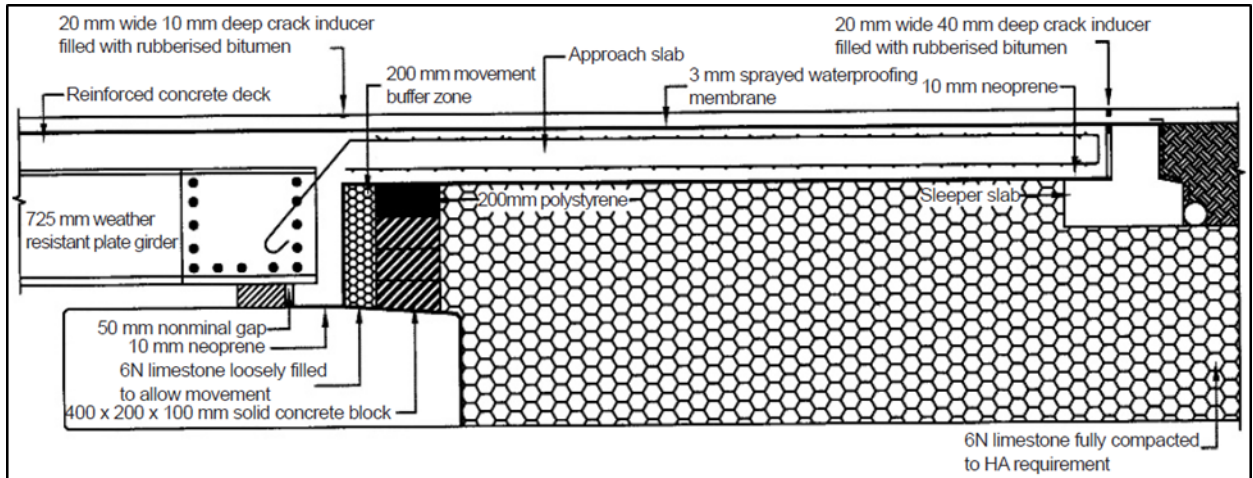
Abutment and Approach Slab Cross Section (Biana 2010)
